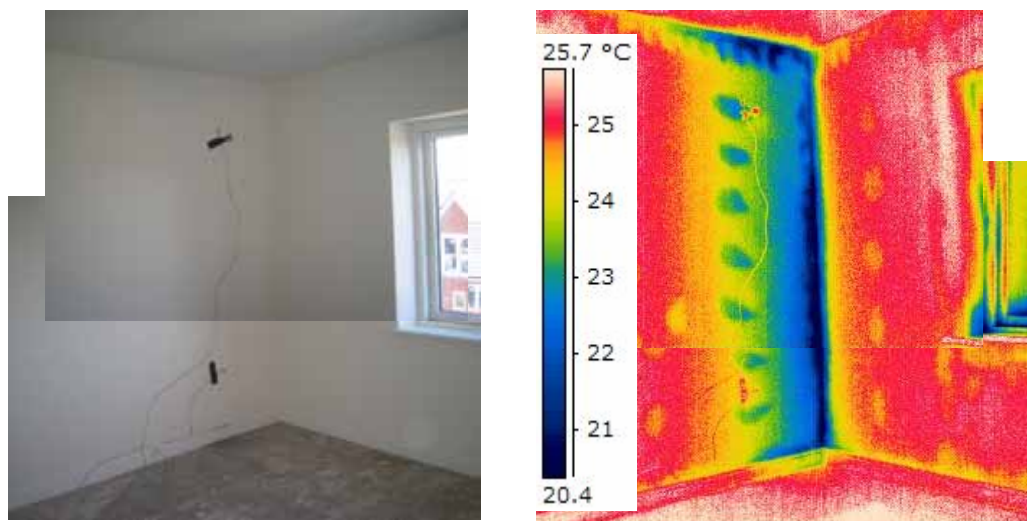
Internal Junction of Party Wall with External Wall – Redrow Plot 110 – Sock Removed
